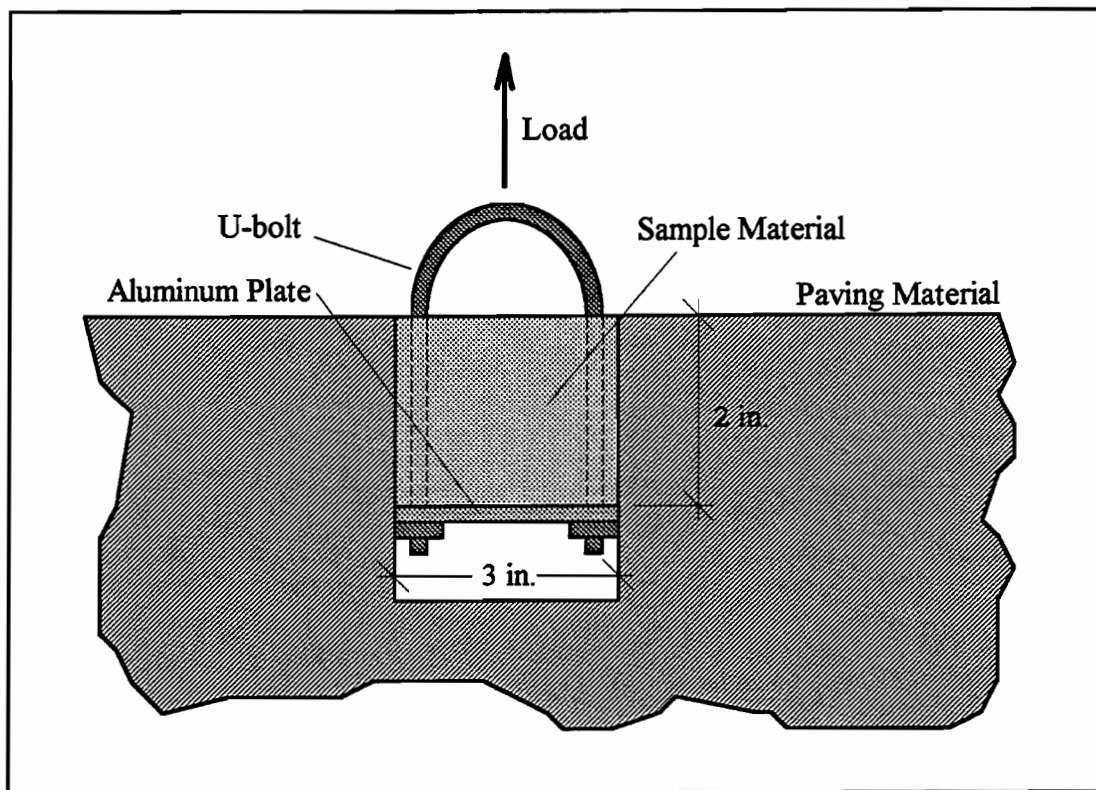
Shear Bond Pull-out Test Setup (1 in. = 25.4 mm)
